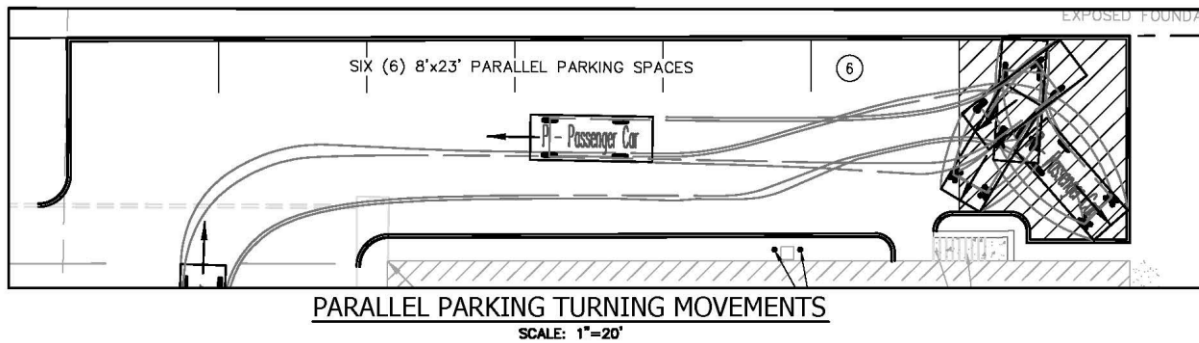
Close-up of the Site Development Plan showing the turning movements to get out of the parking area.
